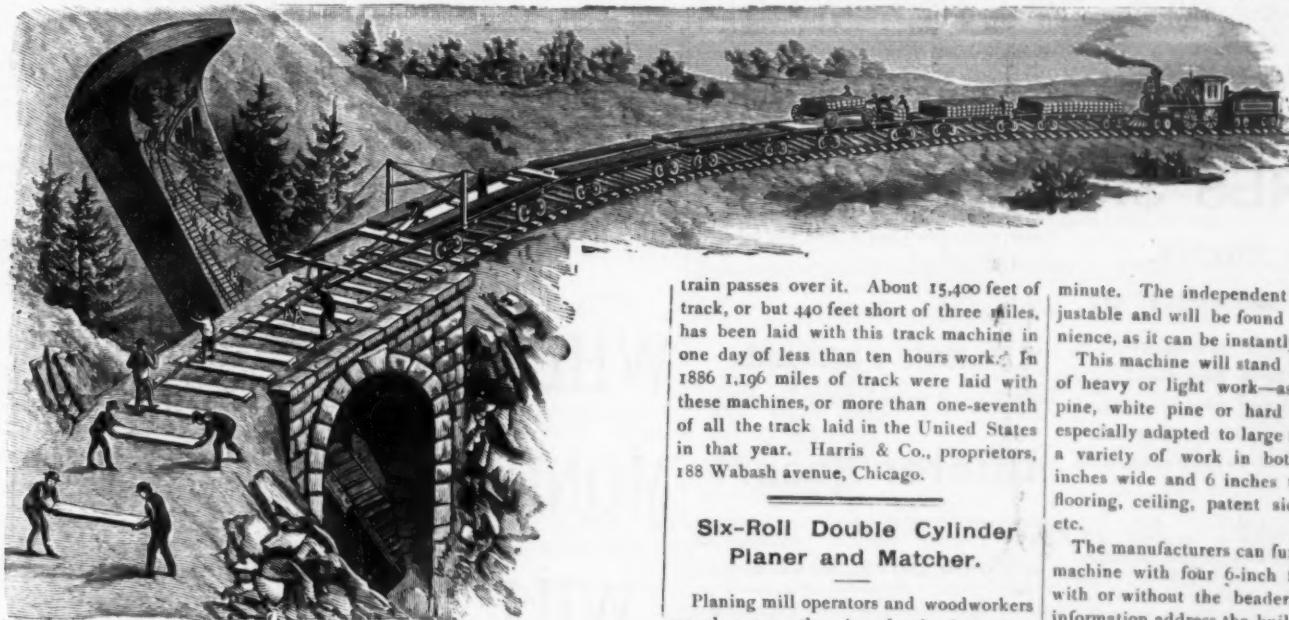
THE HARRIS TRACK-LAYING MACHINE AT WORK.
